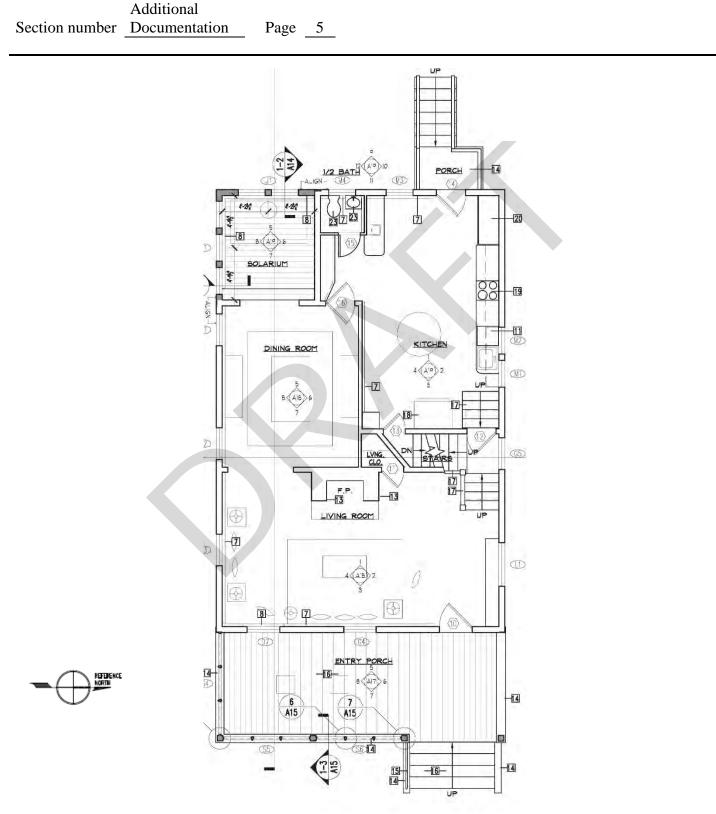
First Floor Plan (Detail, Drawing A3, Gensler 2011)
